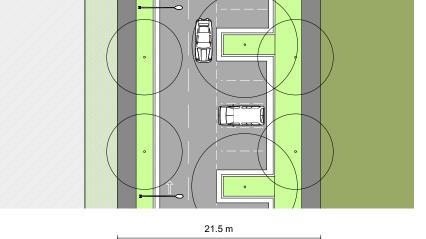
Park Edge Street Boundary Creek – Typical Section and Plan View East
